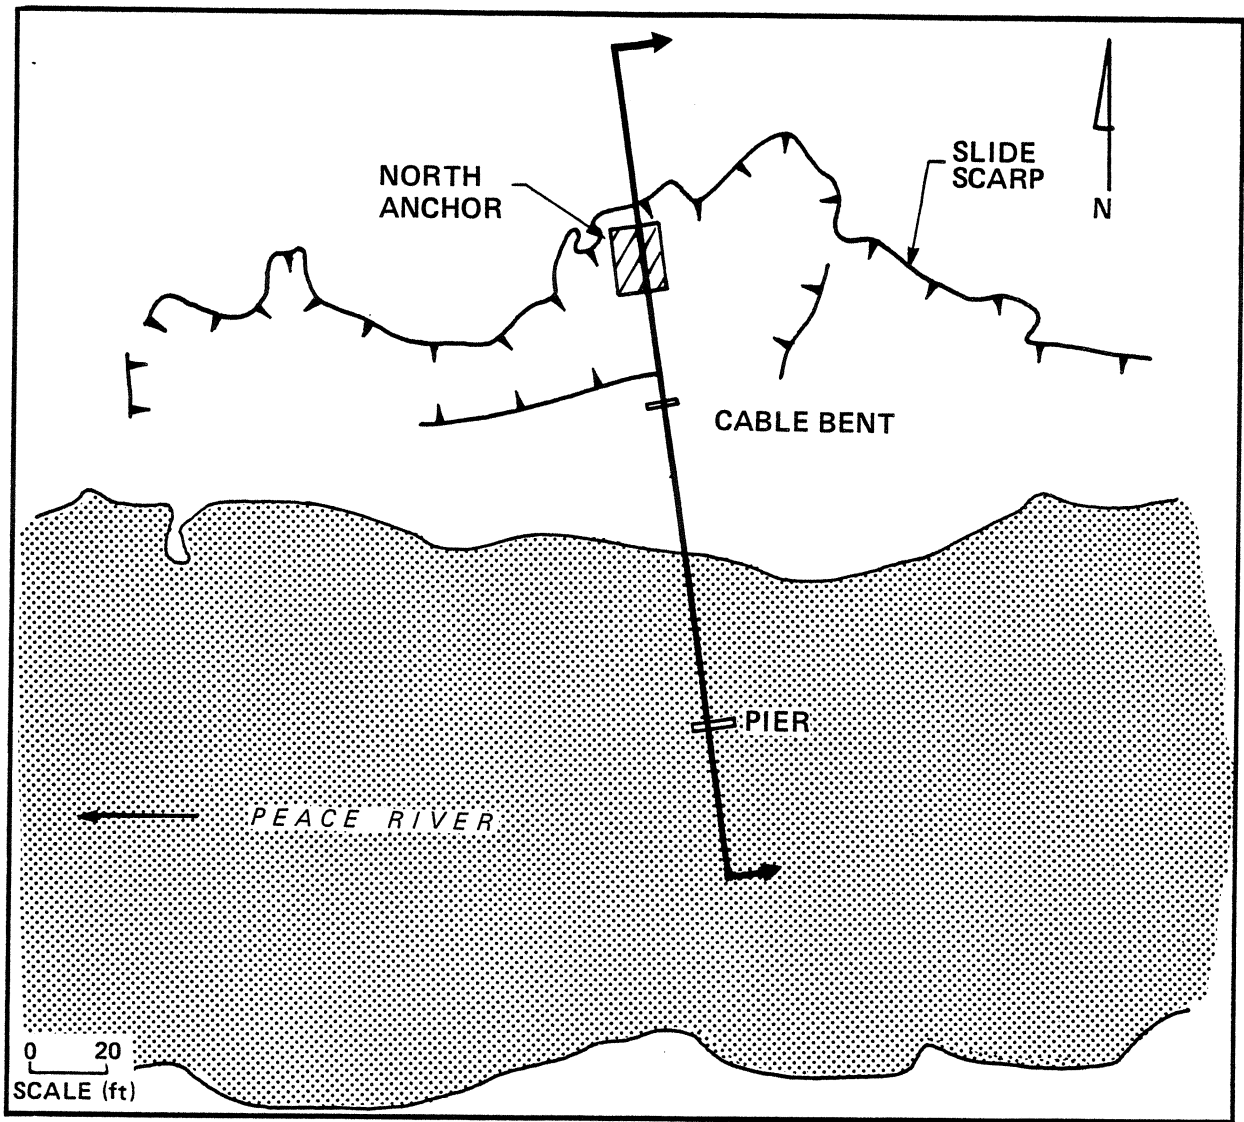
PEACE RIVER BRIDGE FAILURE – PLAN
